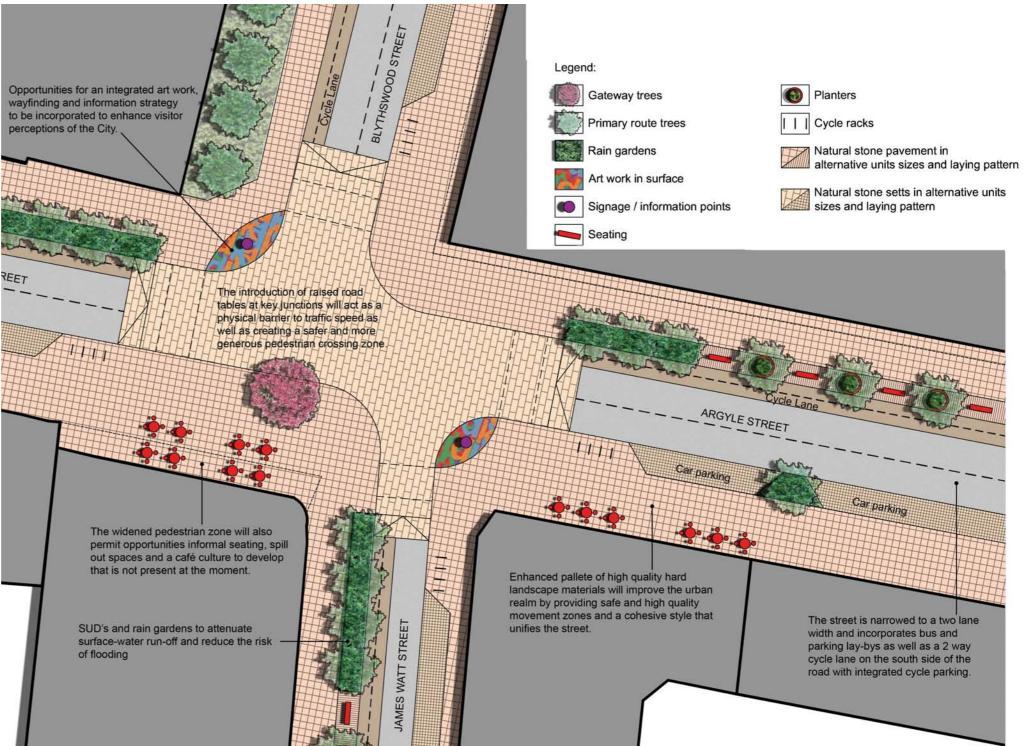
Plan showing possible upgrading and improvements to Argyle Street - much wider pavements would improve the pedestrian experience, with the greening of streets and cafe style outdoor seating (TGP Landscape Architects 2014)
